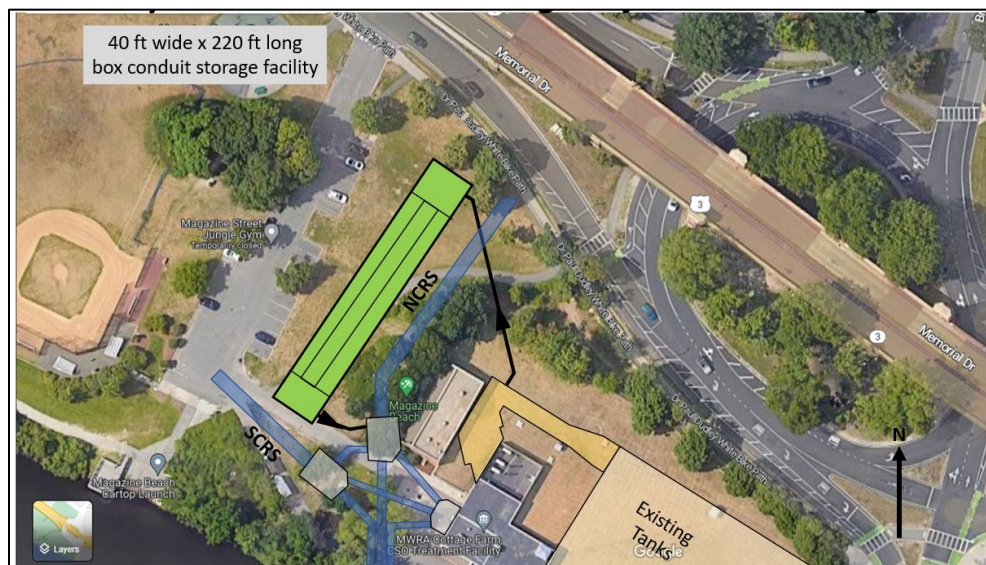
Cottage Farm – Box Conduit Storage Aerial View
